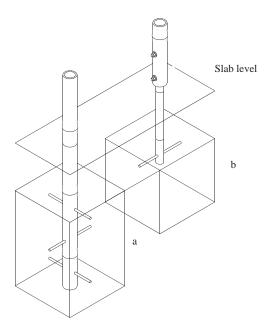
Examples of columns set (a) in concrete footing and (b) on steel shoe.
